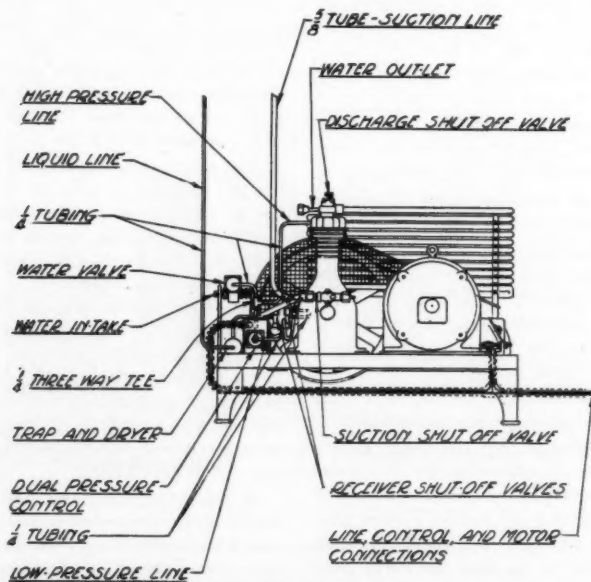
TYPICAL WATER COOLED INSTALLATION
